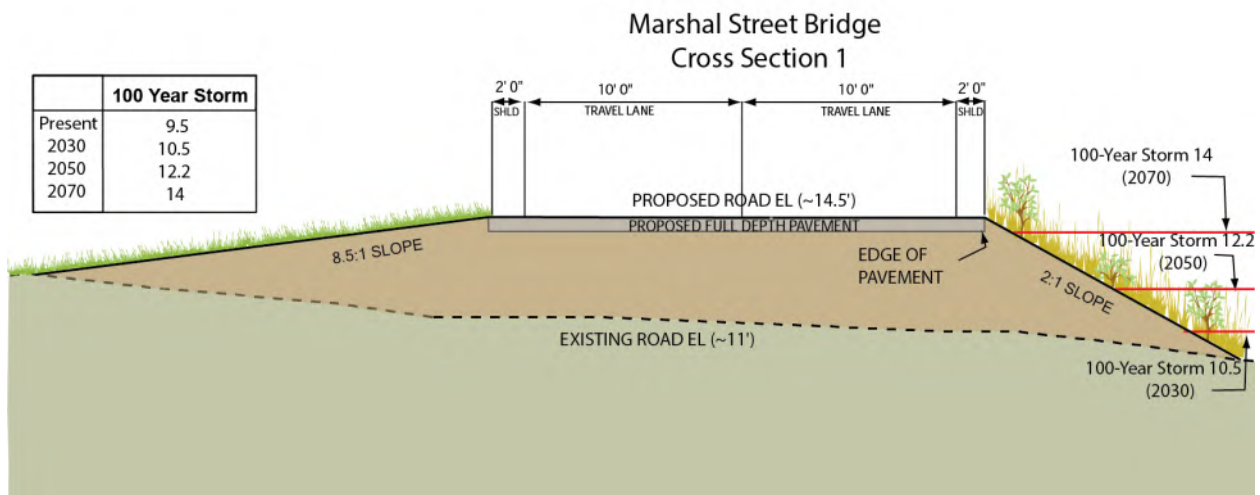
Marshall Street adaptation plan at Cross Section 1
